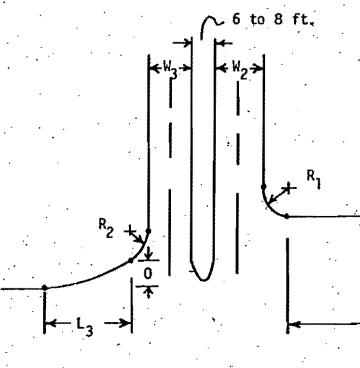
SUGGESTED DESIGN FOR DIVIDED DRIVEWAY ACCESS TO ARTERIAL STREETS (8)
